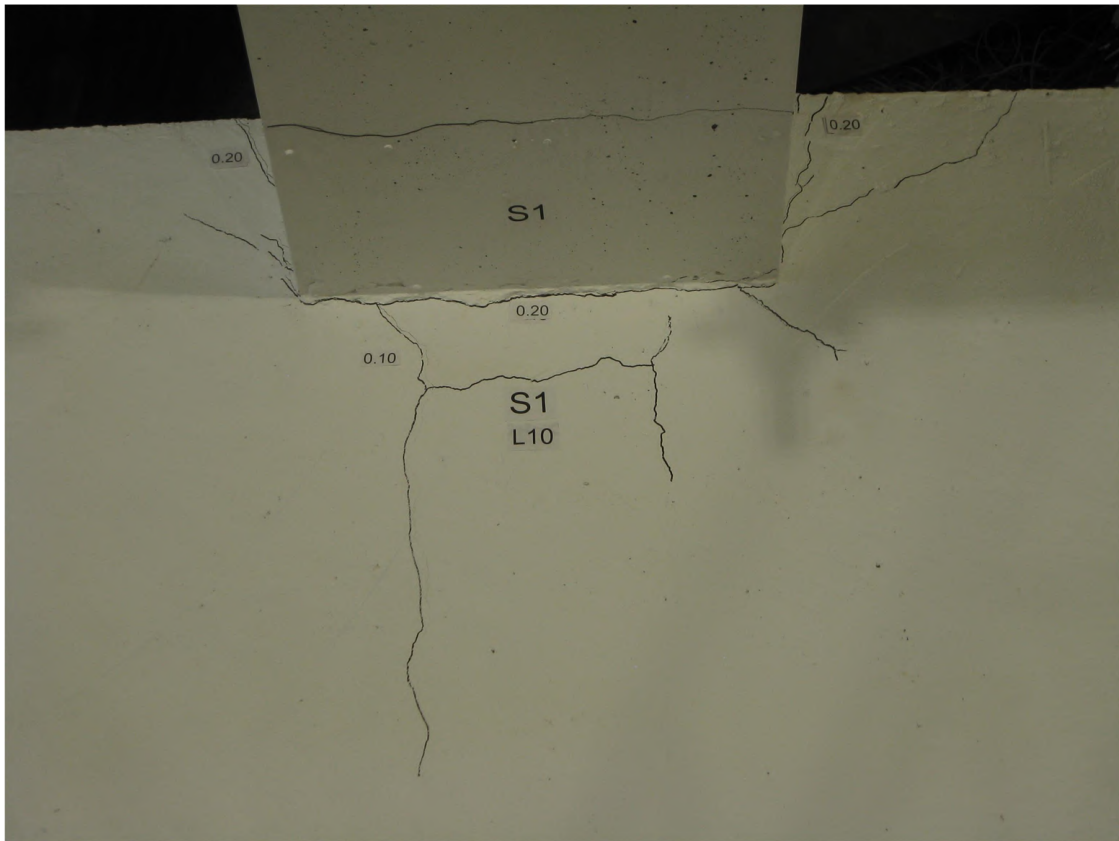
Specimen 1 slab cracks at $V = 113.6$ kN
